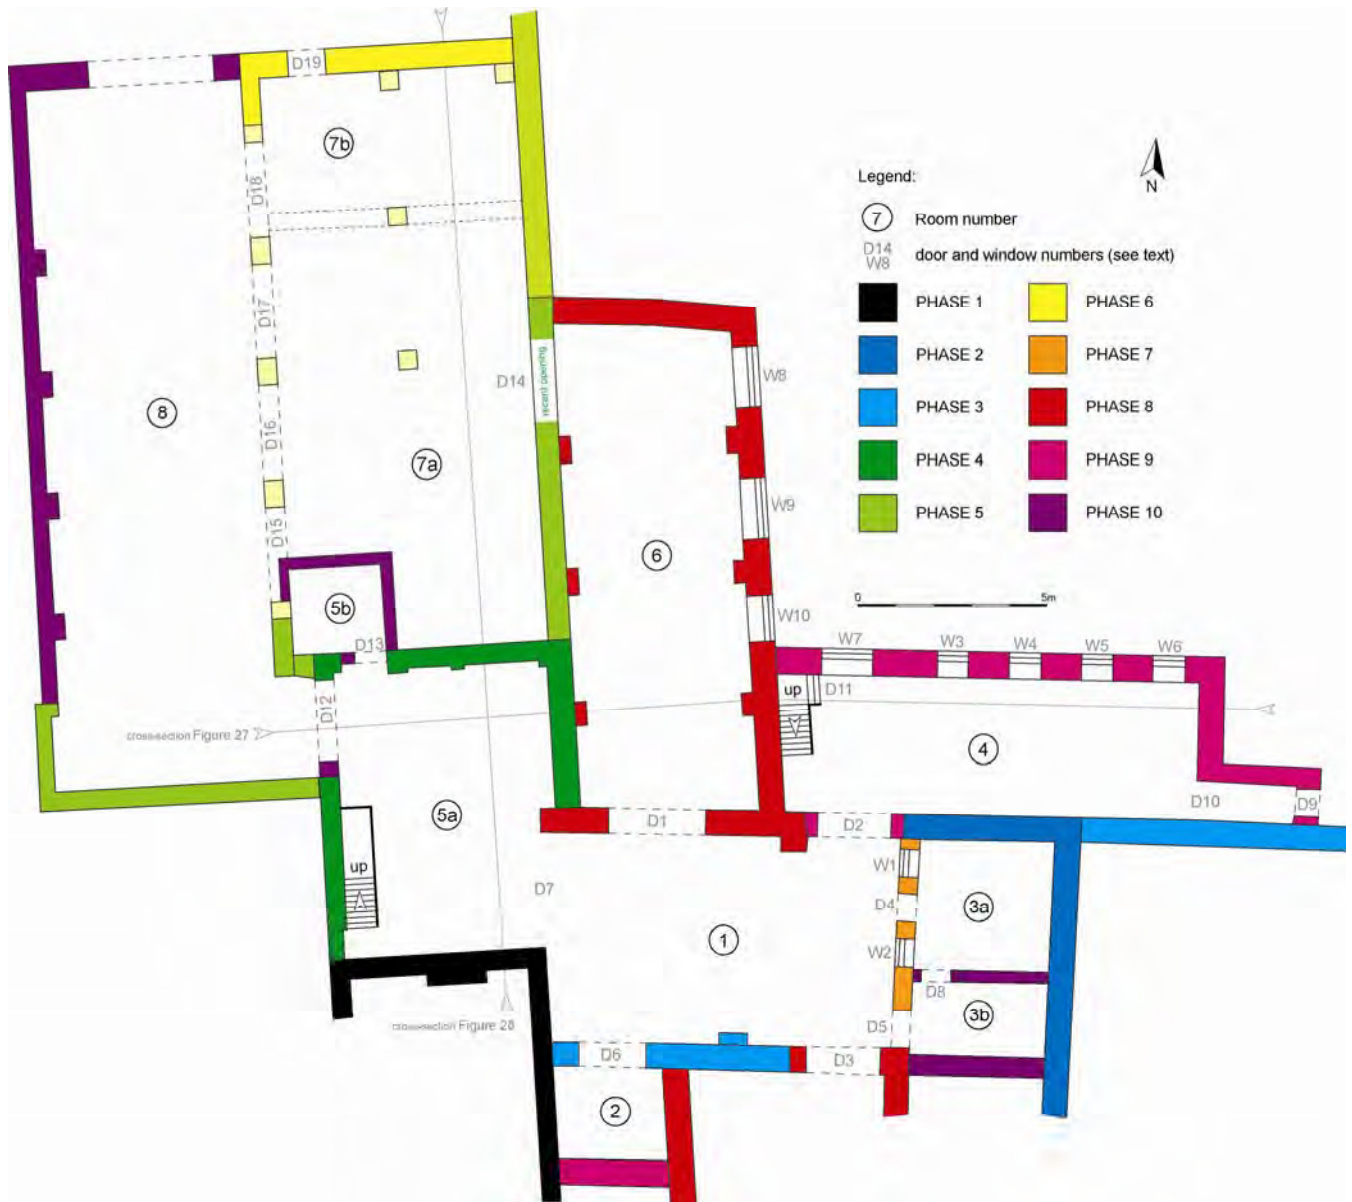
Phased plan of the ground floor, with room numbers and location of cross-sections shown.
